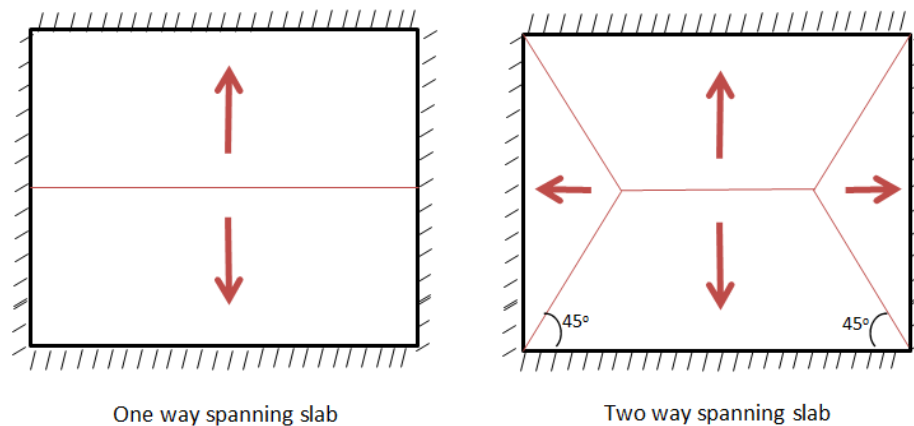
Direction of spanning shown with arrows (Prasad, 2023)
